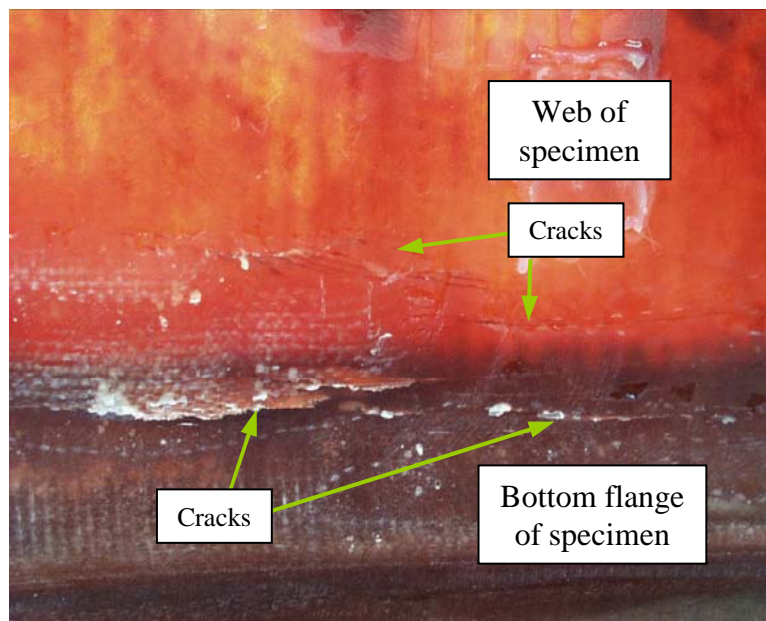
Cracks at Web Where Web Joins Bottom Flange of Girder (East Side)
